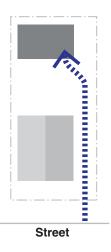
On lots without a lane, a clear pedestrian path should be provided from the fronting street to the coach house. For lots with a lane, access should be from the lane.
